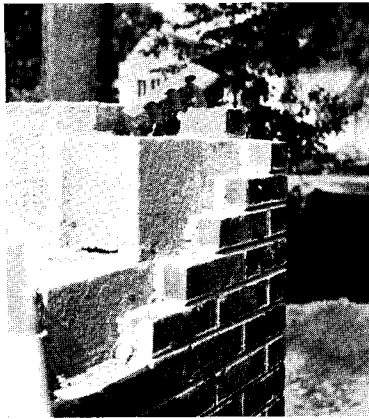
Brick-faced concrete masonry using split brick. A saving in construction cost results from smaller quantity of face brick required.
